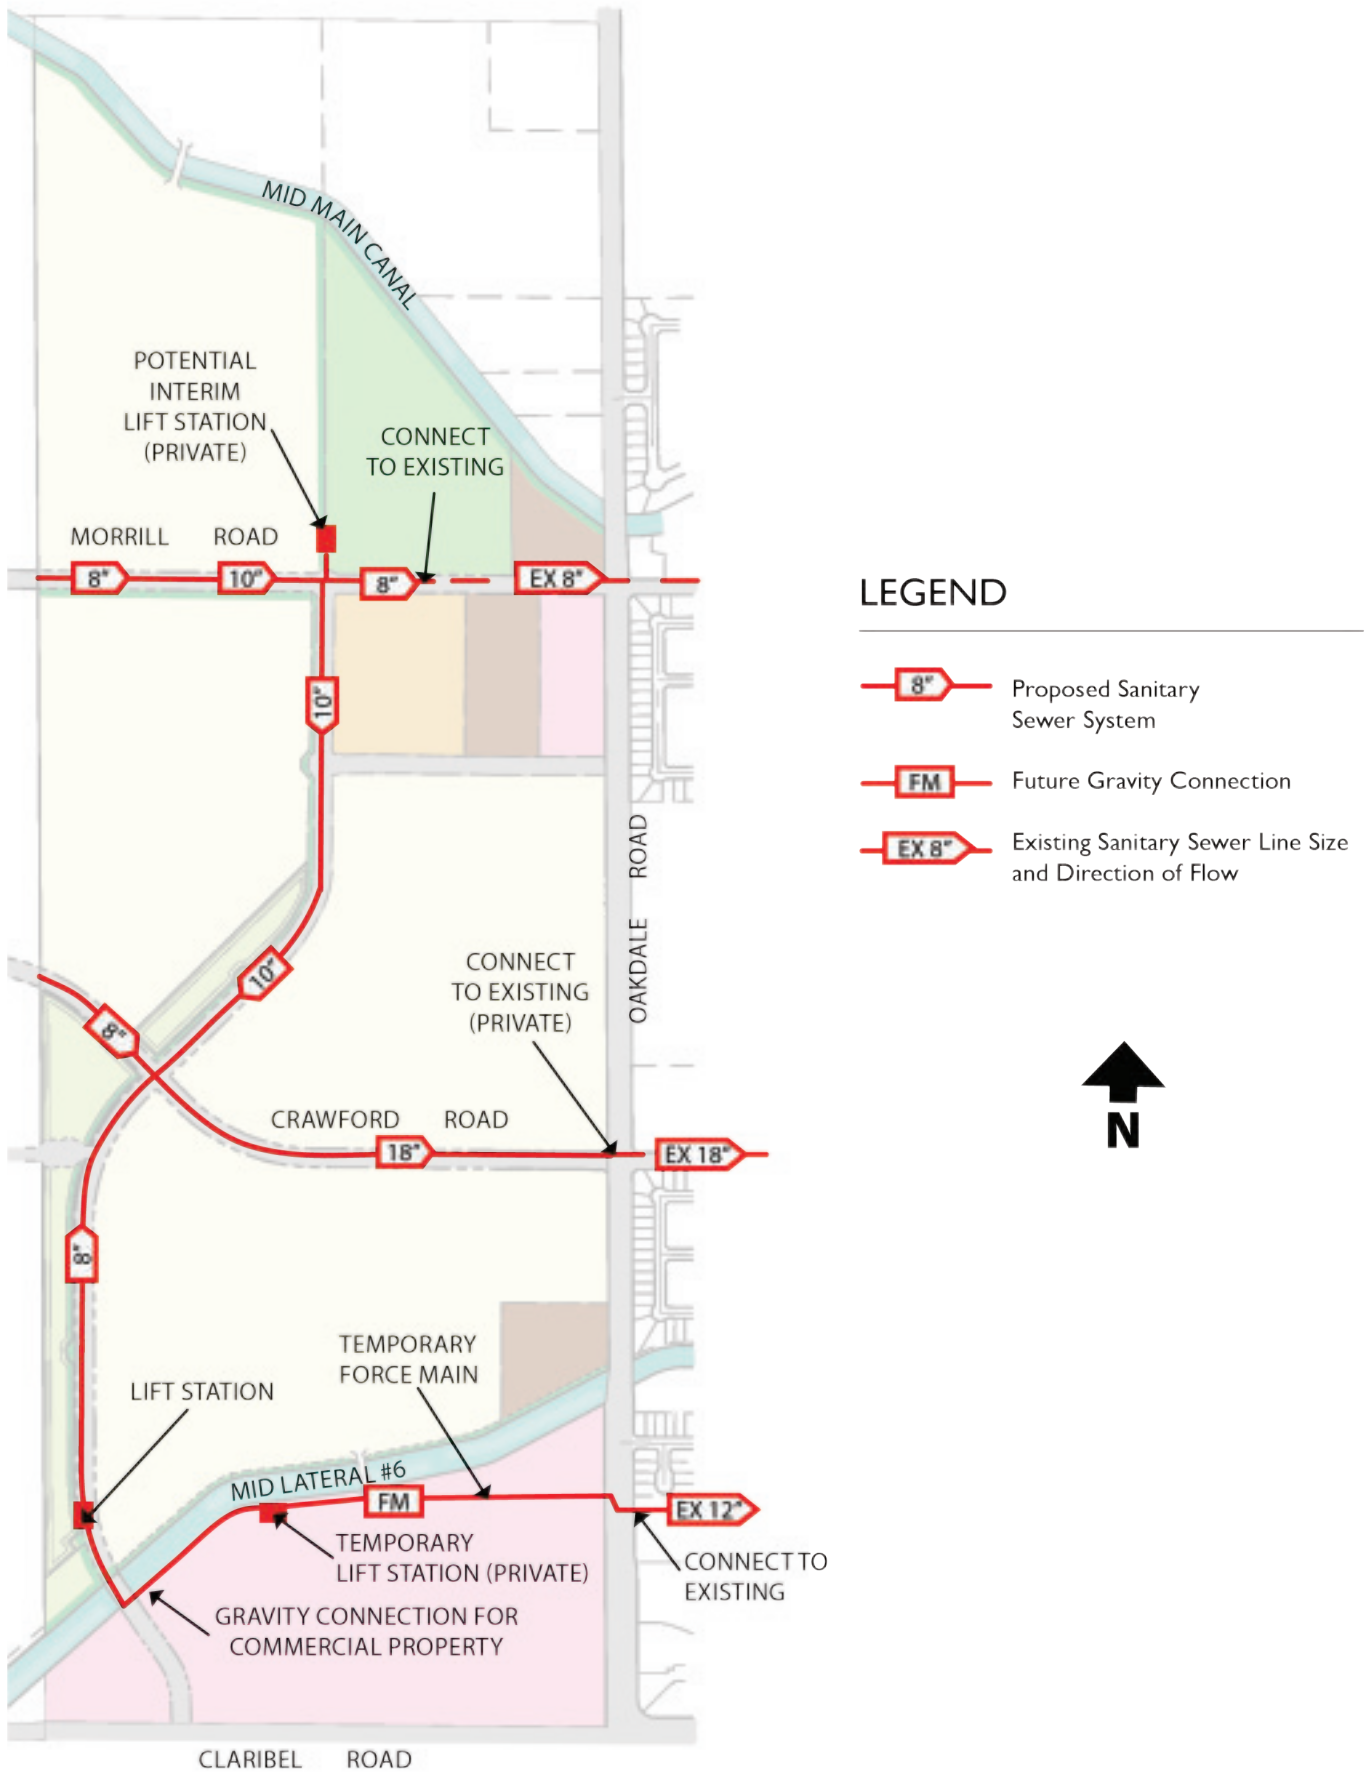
Proposed Crossroads West Sanitary Sewer System
